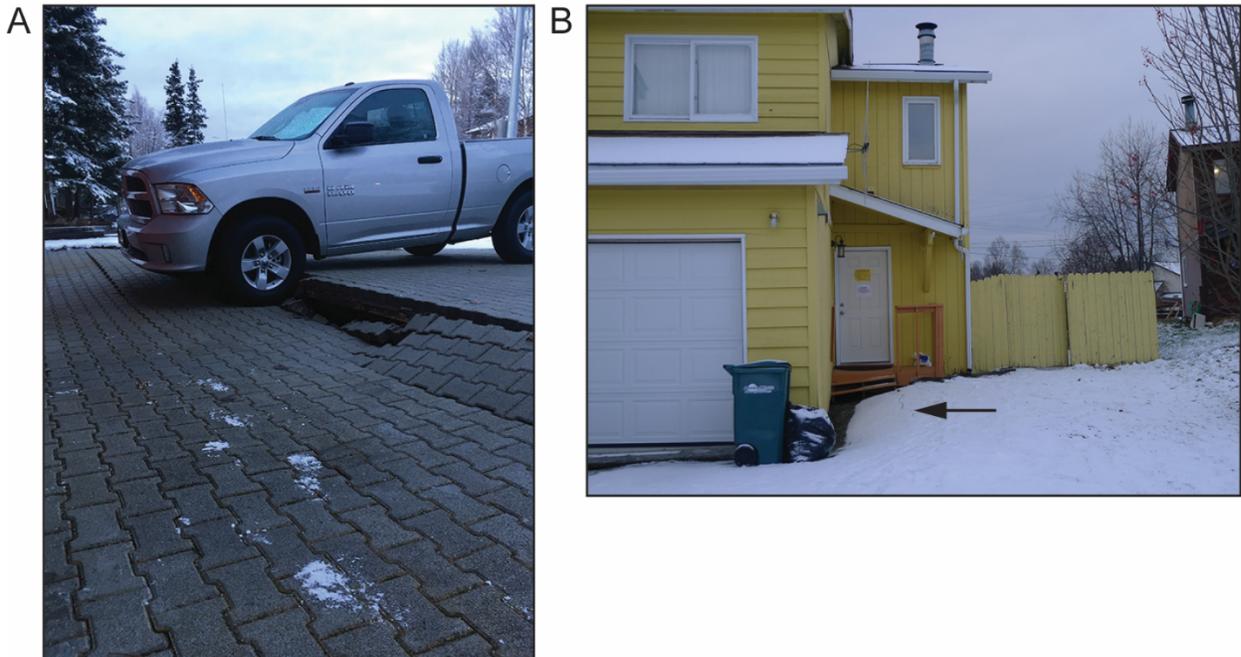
Typical foundation settlement damage in the Campbell Lake area of south Anchorage. (A) Drive way settlement (Lat/Long: 61.1334, -149.9313). (B) Duplex settlement along arrow (Lat/Long: 61.1379, -149.9380). Settlement was about 30 cm at each site.
